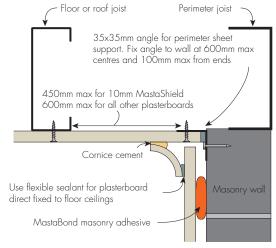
Ceiling to Masonry Wall Direct fixed to joist
